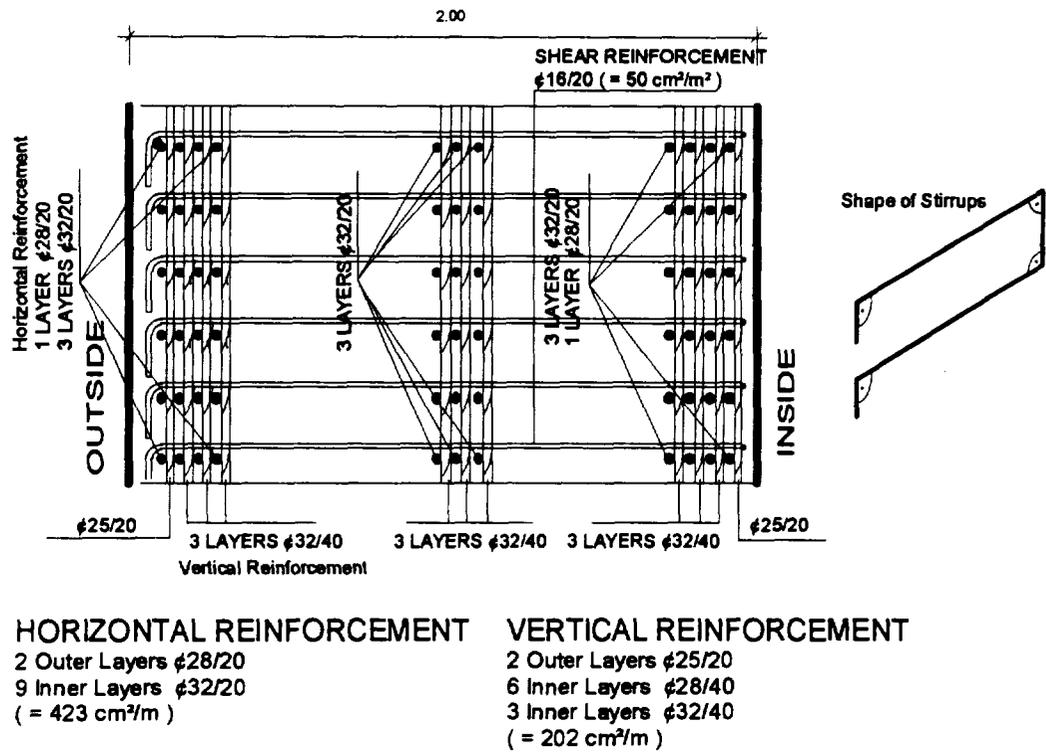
Typical arrangement of reinforcement at the cylindrical part
